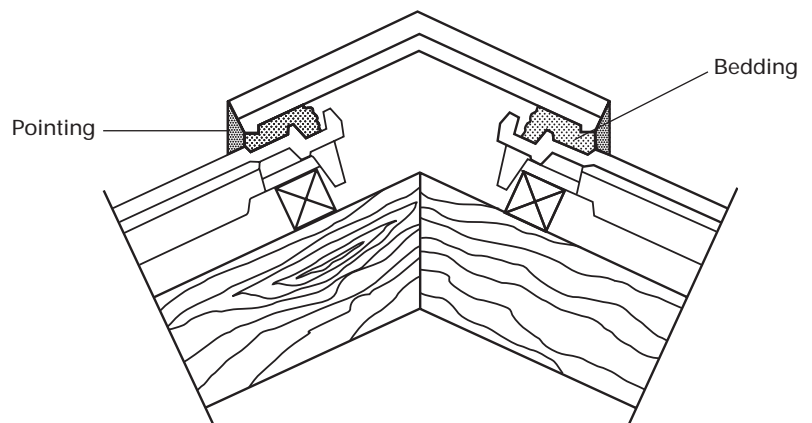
(b) Vee Ridge (81°) Typical Detail
